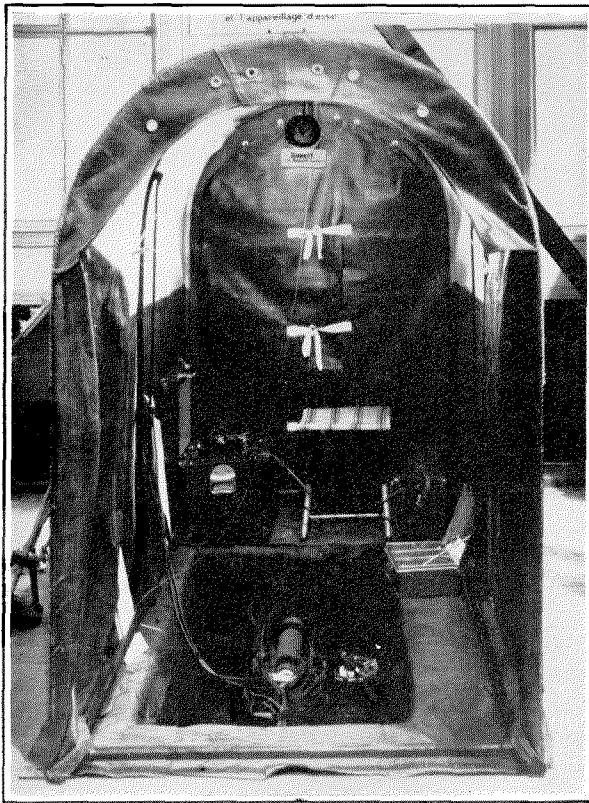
Jointers Tent showing jointing chamber with cable being jointed
